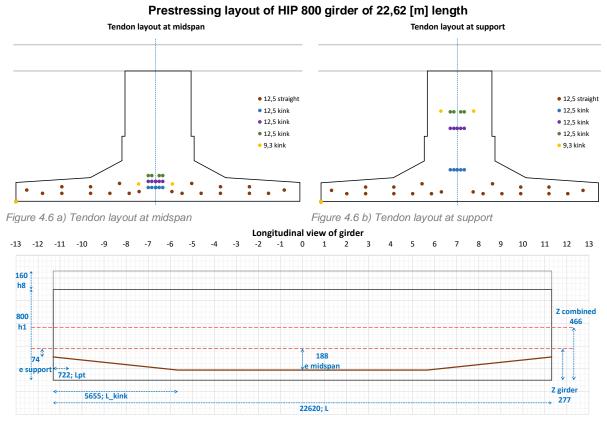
c) Longitudinal view of simplified prestressing layout, all strands are replaced by one equivalent tendon.
